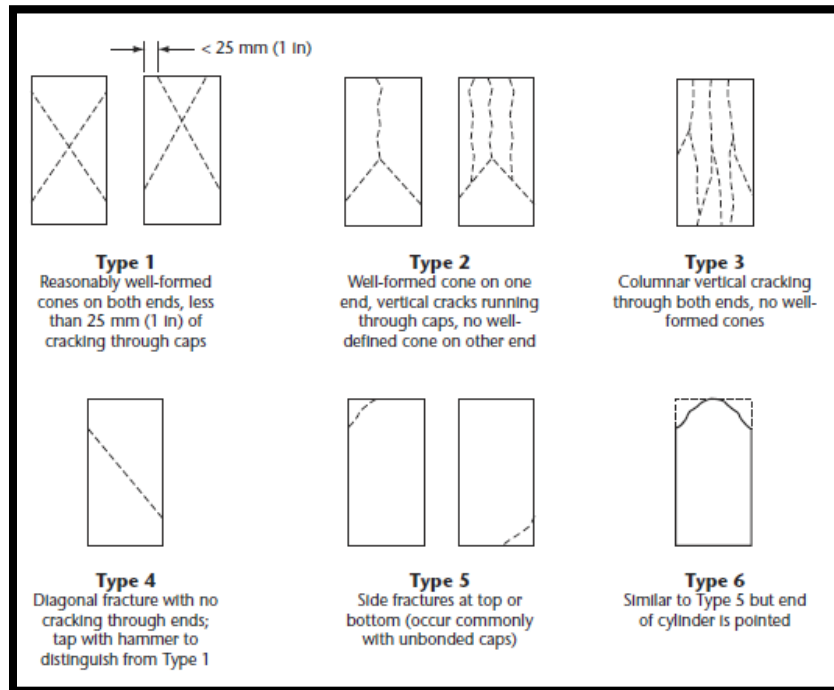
Sketches of types of fracture of concrete specimens (CSA, 2009)
